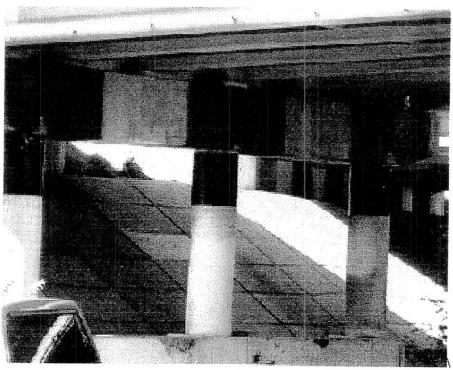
D COLUMN AND CAPPING BEAM AFTER STRUCTURAL RETROFIT
